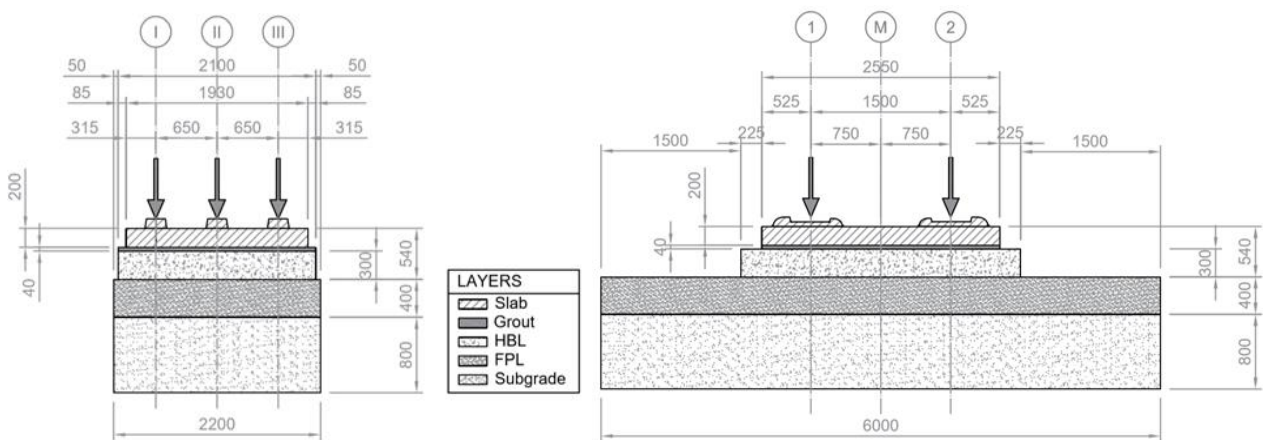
Cross section and longitudinal views of the slab track system (dimension units: mm)
